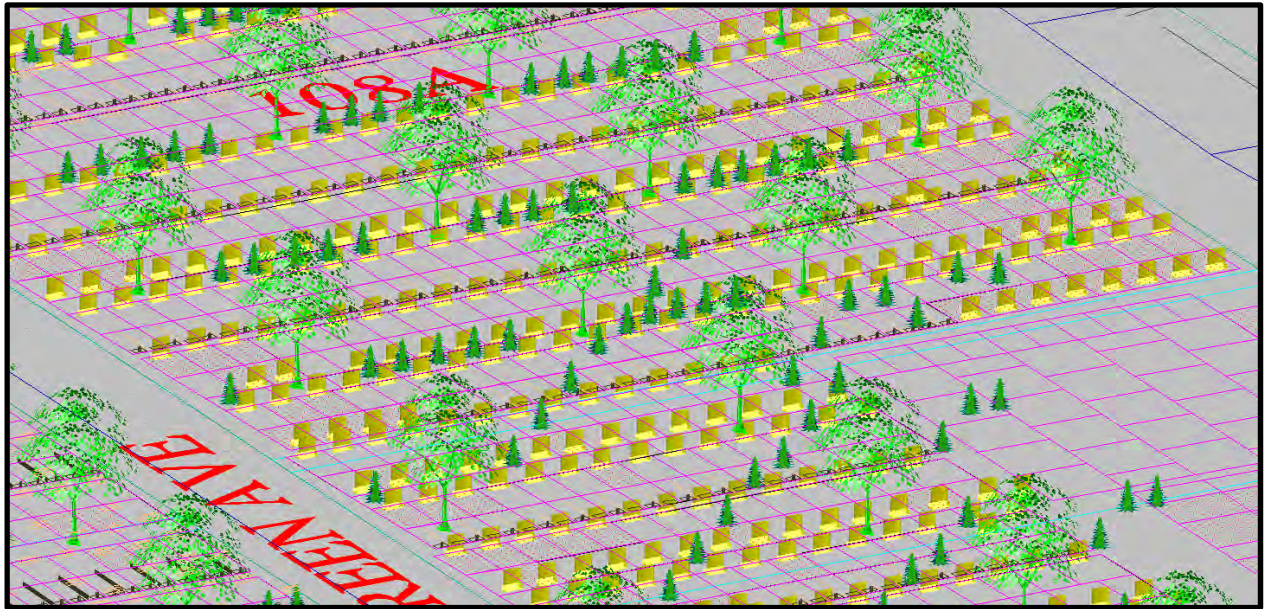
3D View of Section 108A with Potential Modified Memorials and Planting
